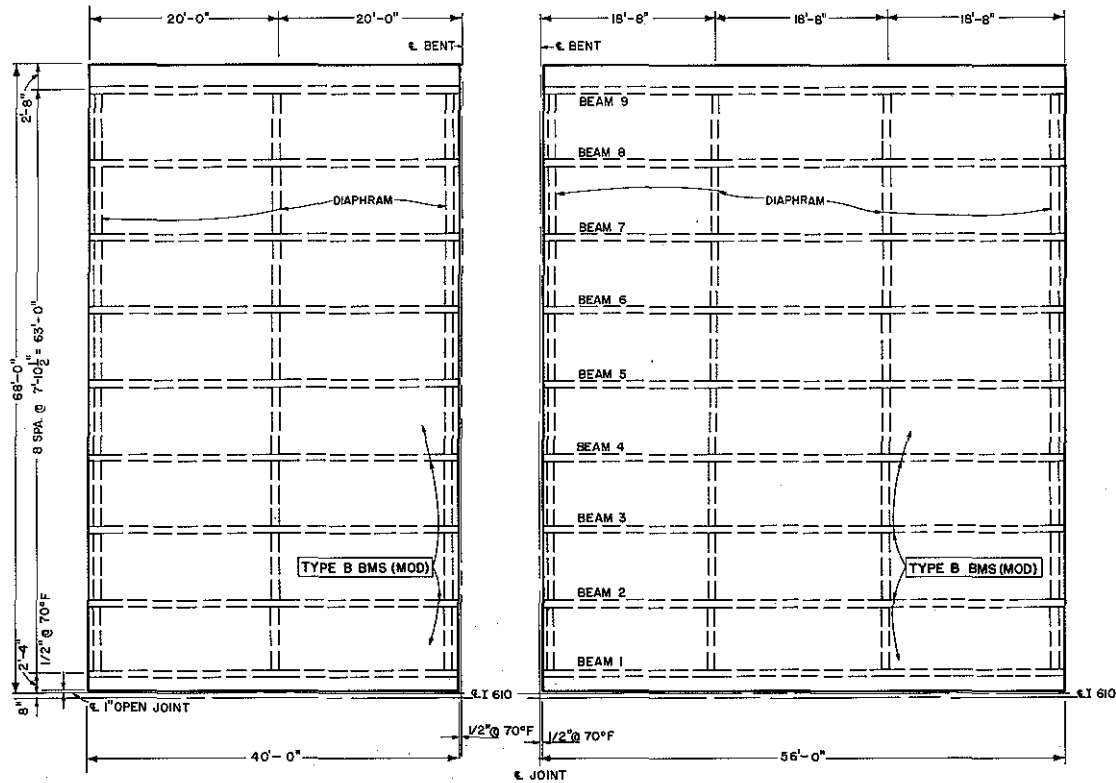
GENERAL PLAN OF BRIDGE
